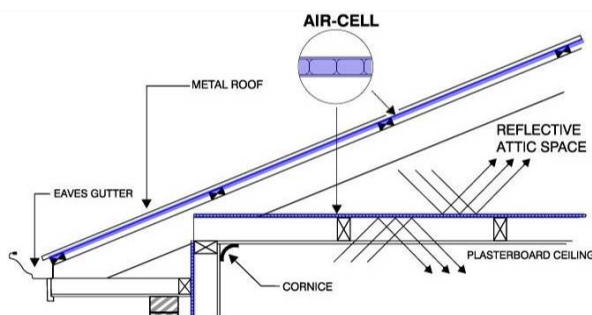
Typical section showing hybrid roof insulation for a pitch roof arrangement
